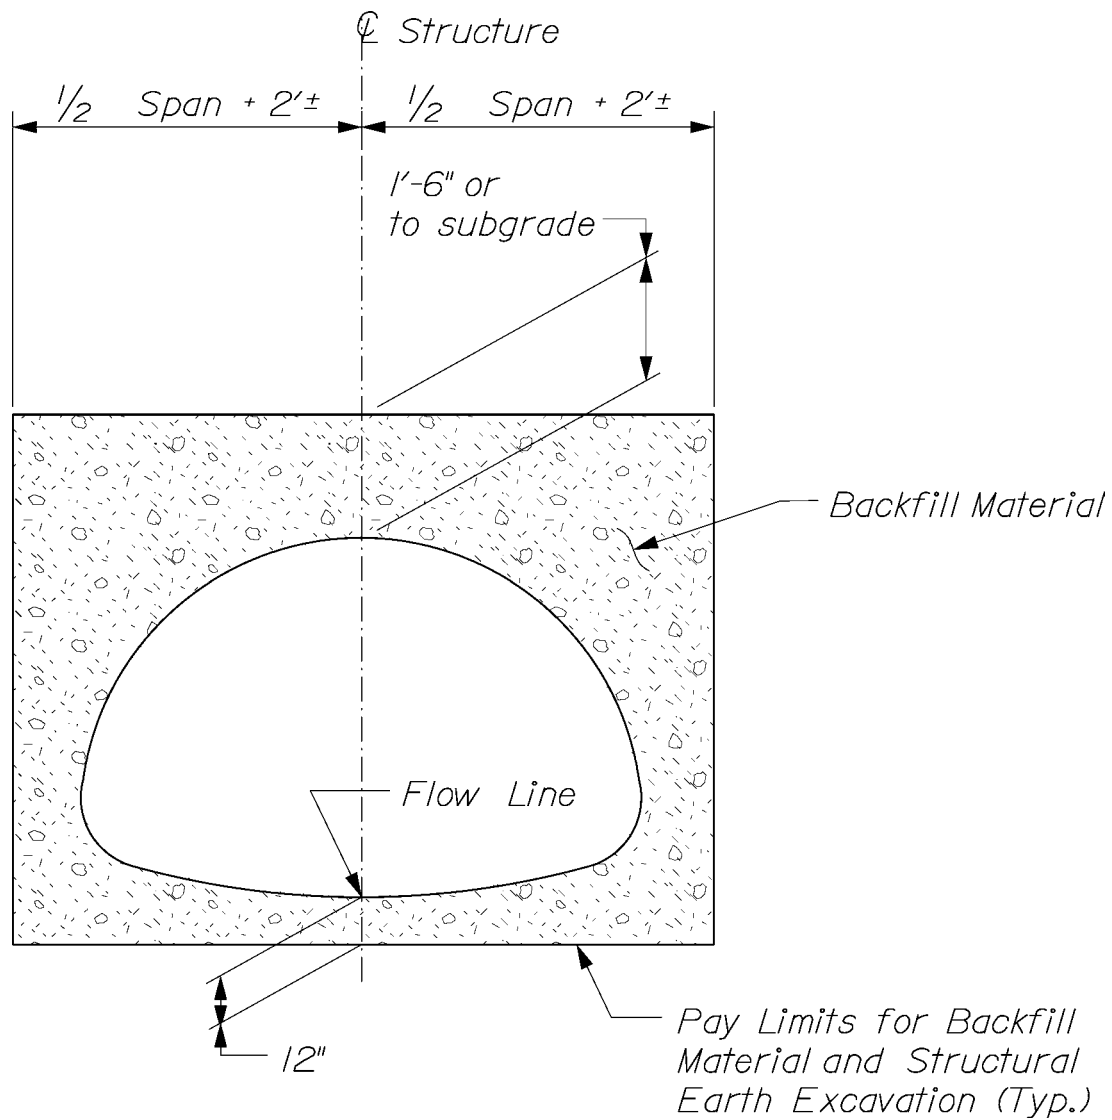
Excavation and Backfill Limits for Pipe or Pipe Arch Structures
